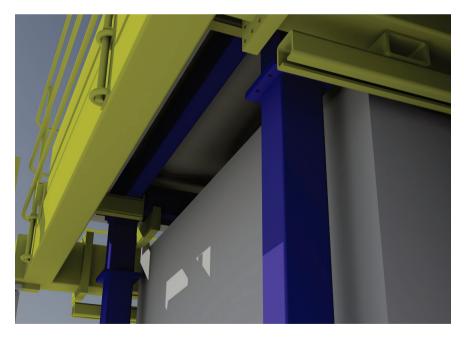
Connecting building with the floor below [Routine 3:R3.A]
